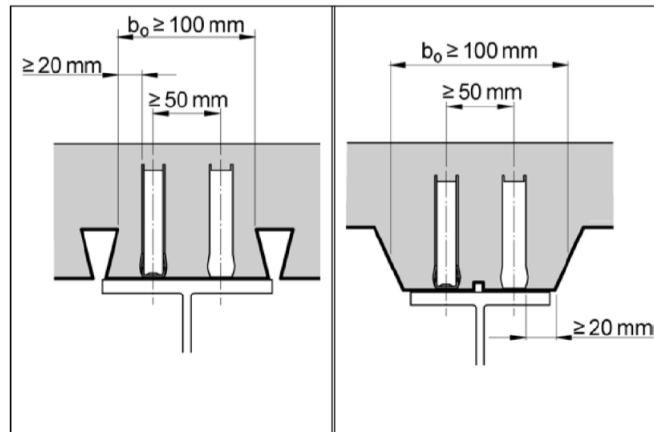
Spacing of connectors for slabs with decking parallel with the beam (multiple rows).
